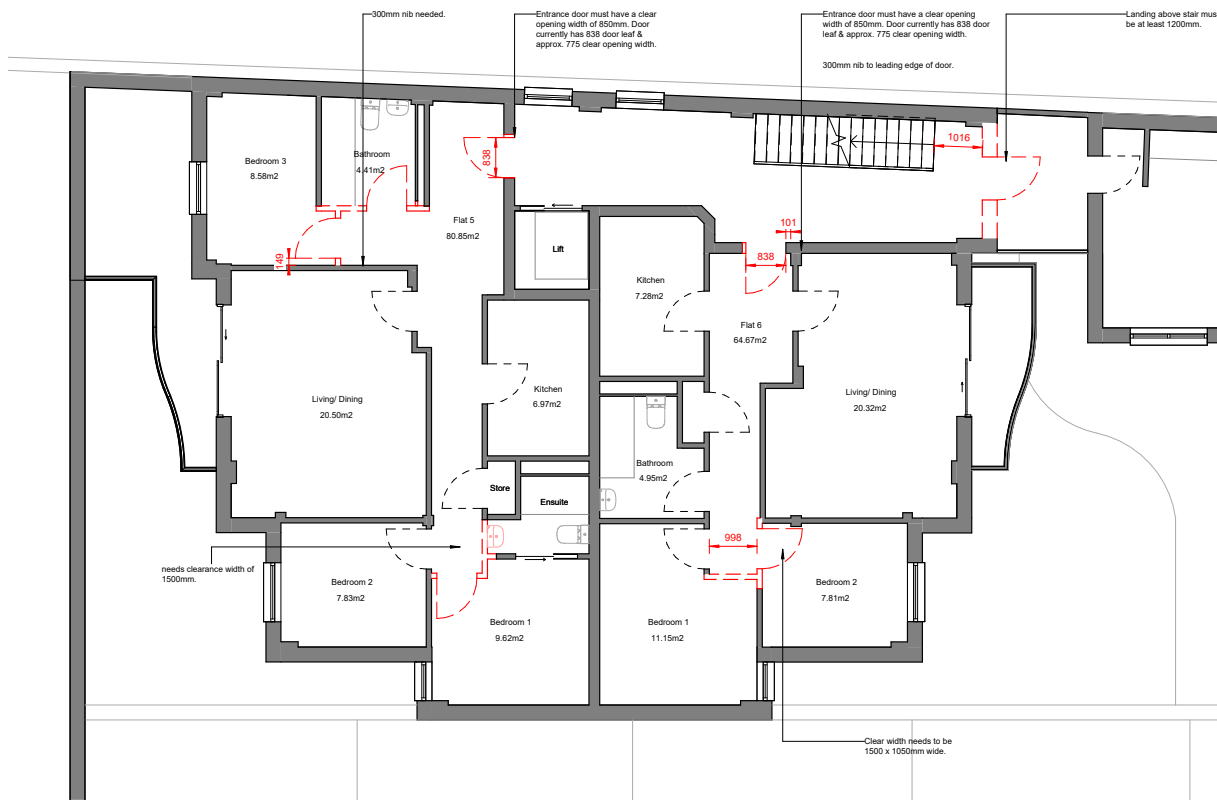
BLOCK 3 APPROVED FIRST FLOOR PLAN
